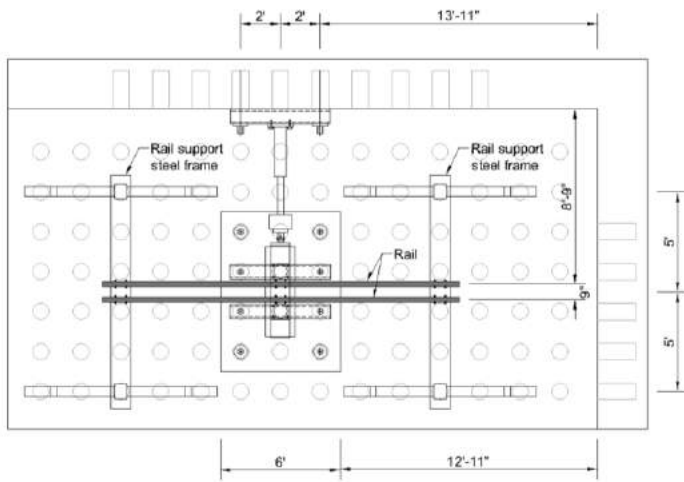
Proposed Test Setup for Specimen 2 and 4
